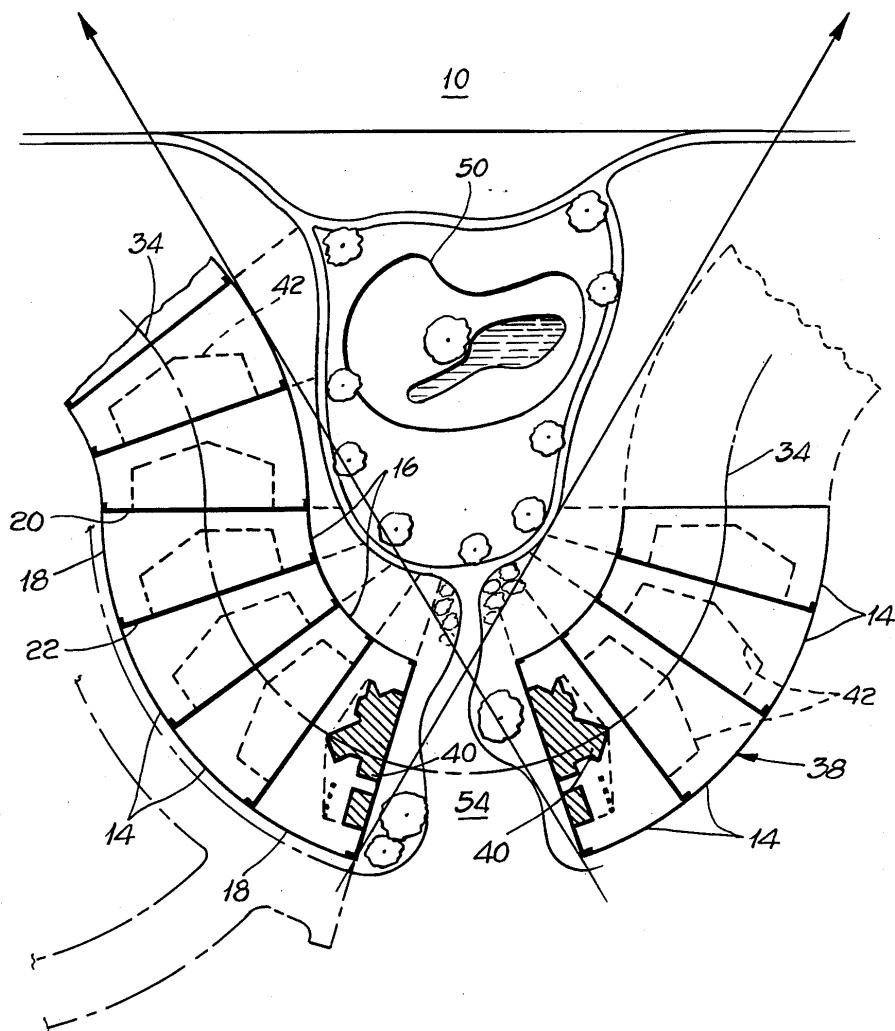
Building Arrangement Maximizing Views, U.S. Patent No. 4,852,313.
